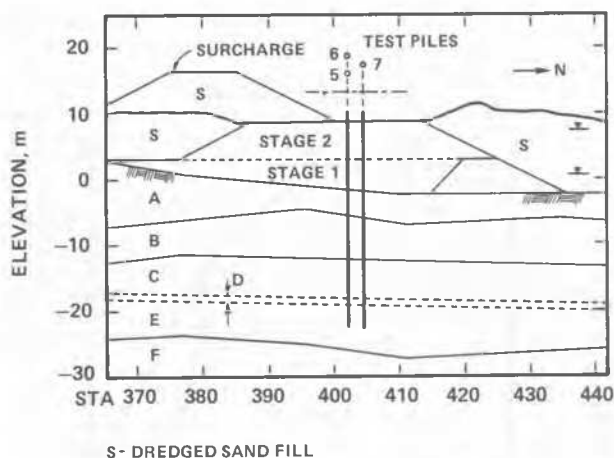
Section through test embankment showing test piles, dredged sand fill and subsoil formations
